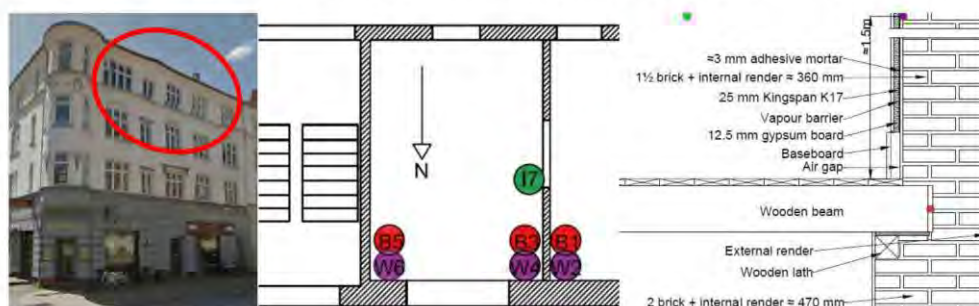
left to right; Kildevældsgade facade with indication of insulated walls, sensor placement on floor plan, and construction with sensor placement.
